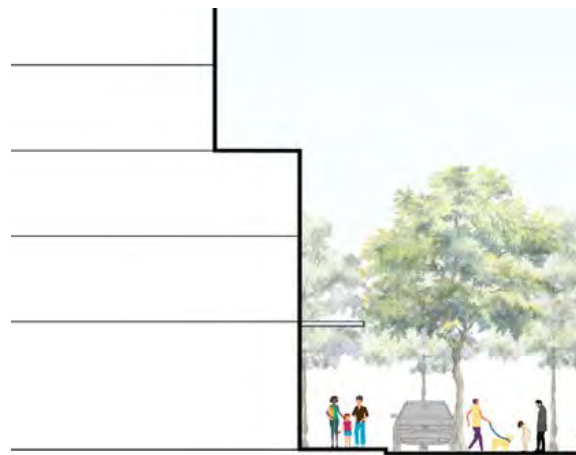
Building 2A lobby entrance to Huron Lane (Section 3)
